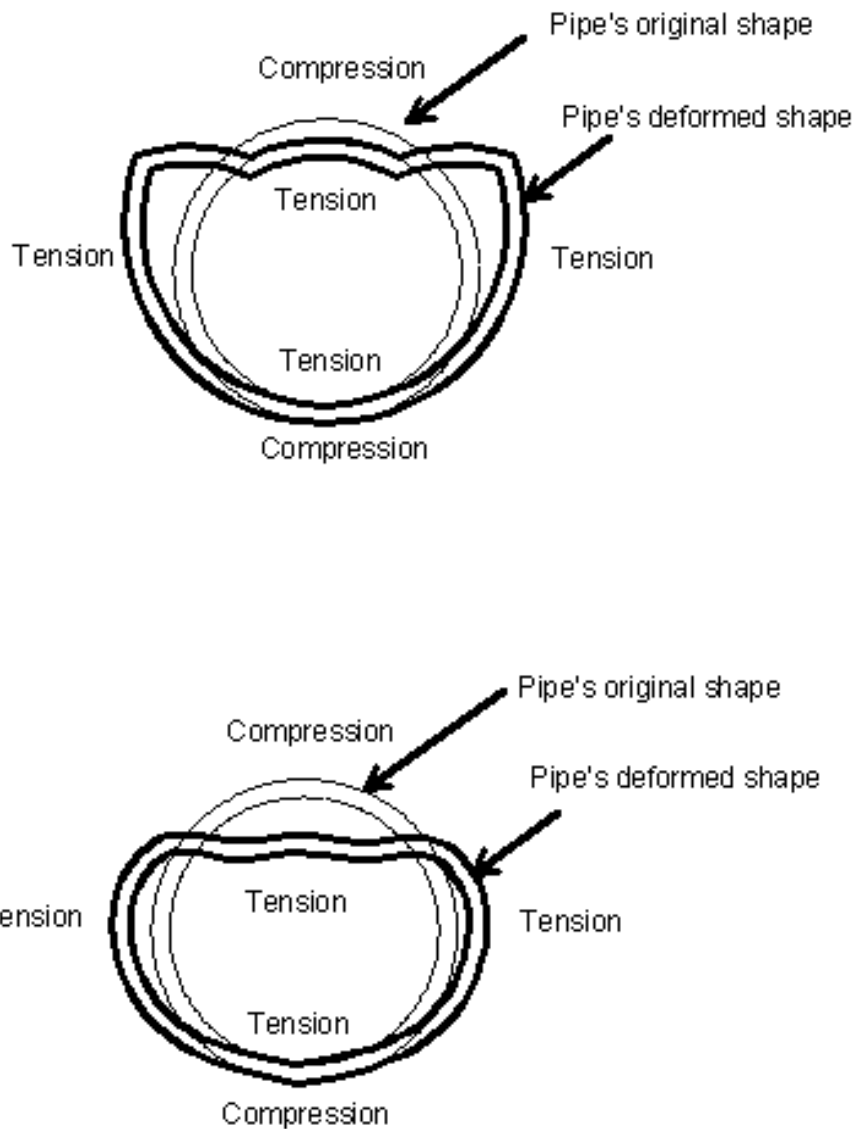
Failure Modes of 36 in. (91 cm), and 48 in. (122 cm) Pipes. (a) SR-HDPE Pipe. (b) CMP Pipe.
